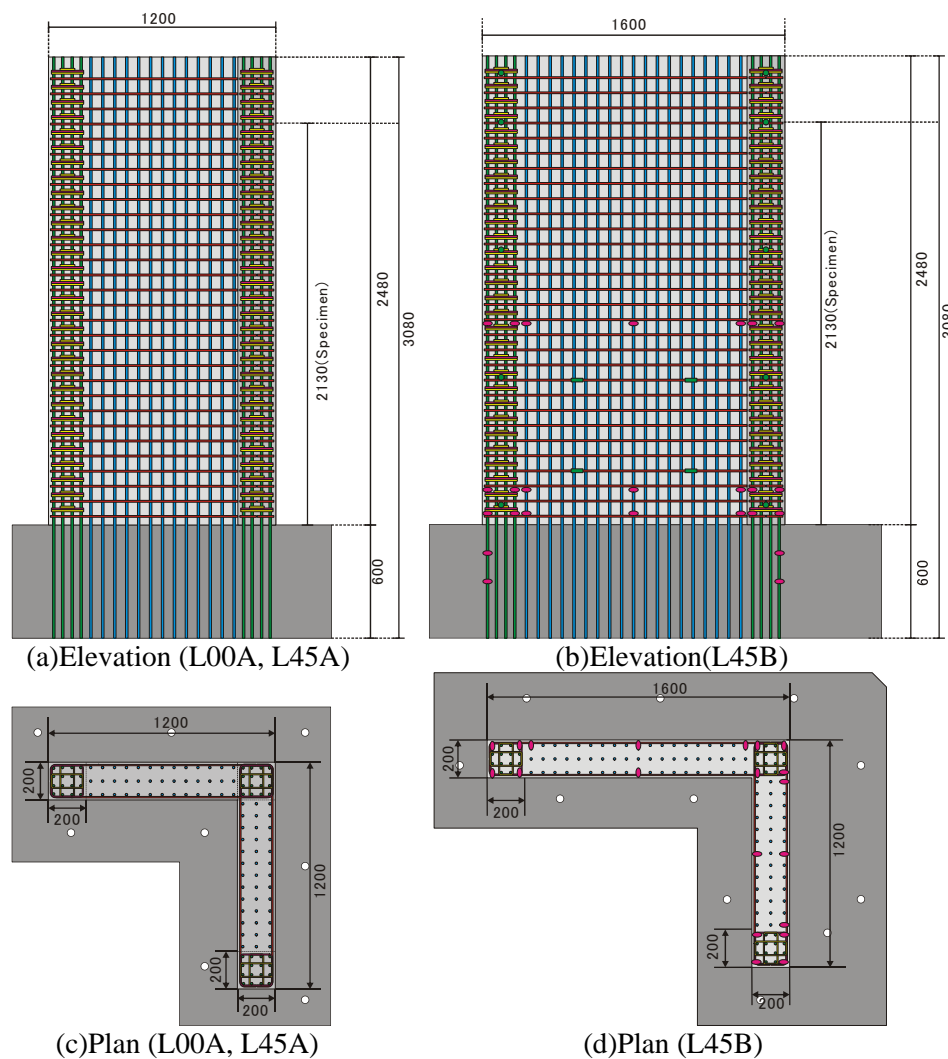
Configuration and reinforcement arrangement (Unit: mm)
